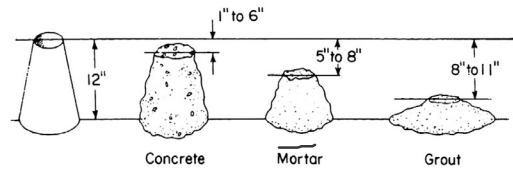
Slump test comparison of concrete, mortar, and masonry grout.
